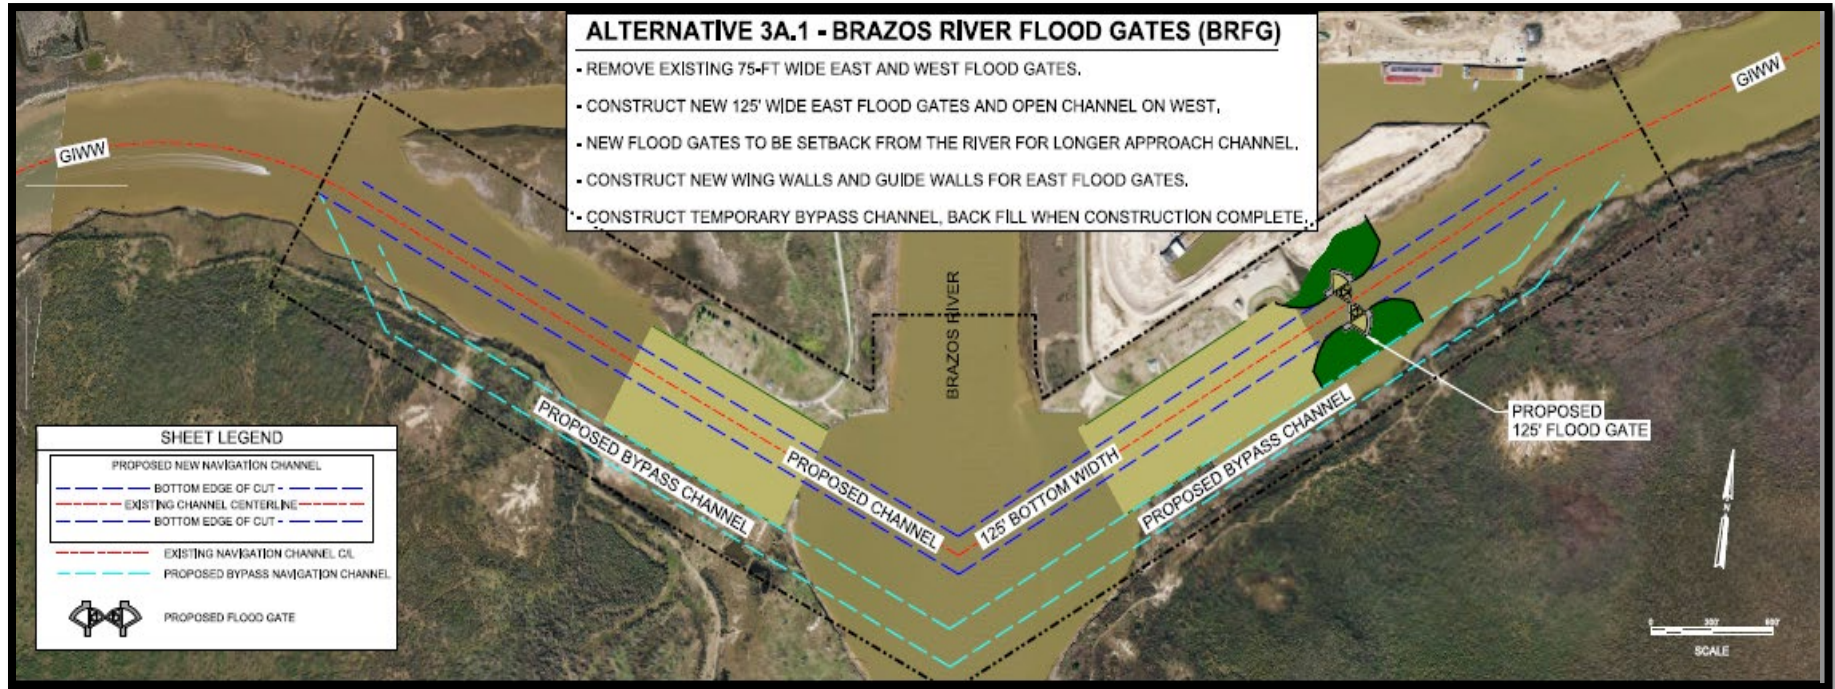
BRFG Components of TSP Plan – Alternative 3a.1
